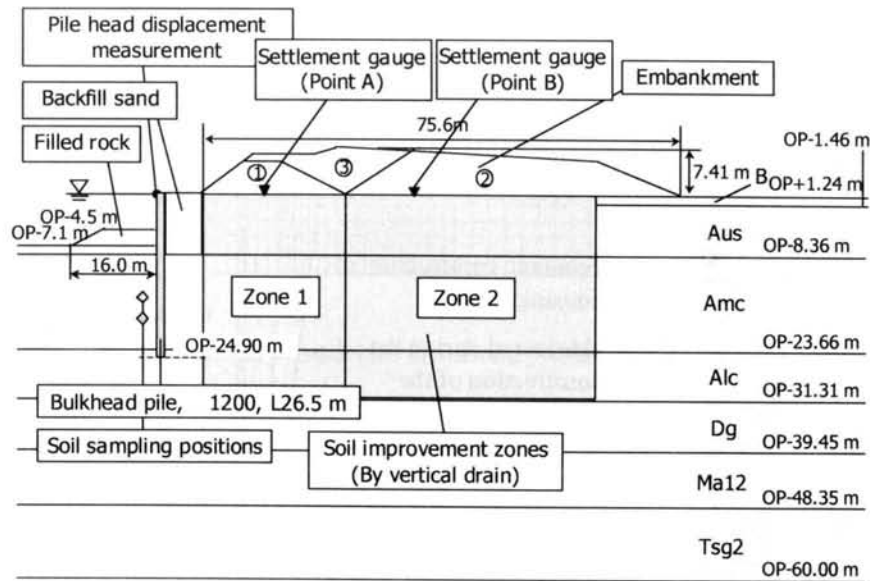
Geometry of the embankment's cross section, the locations of the measuring instruments, the soil sampling positions, and the soil layers
